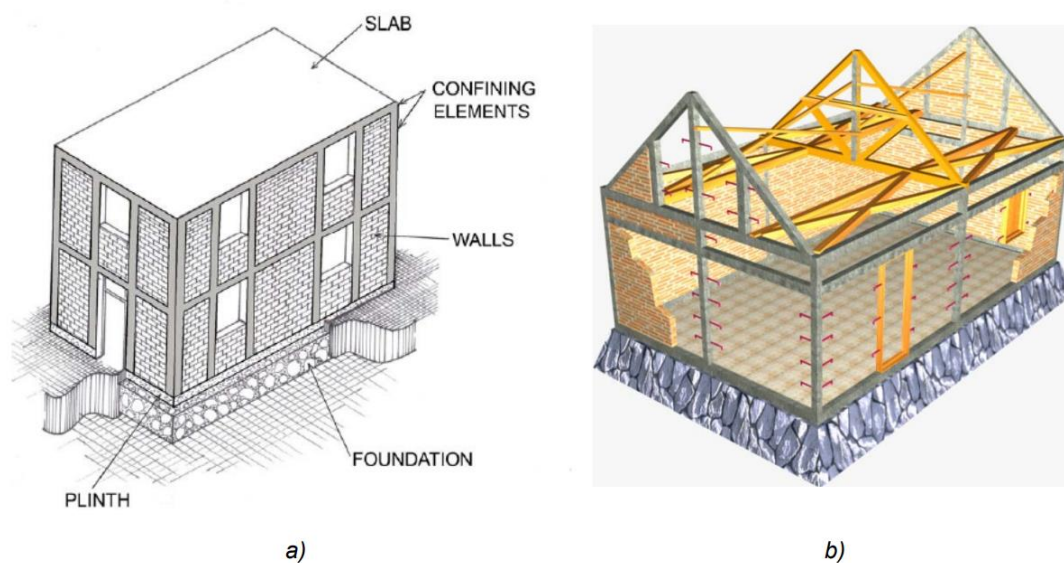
Typical confined masonry building: a) flat RC roof and b) pitched timber roof. [15]
